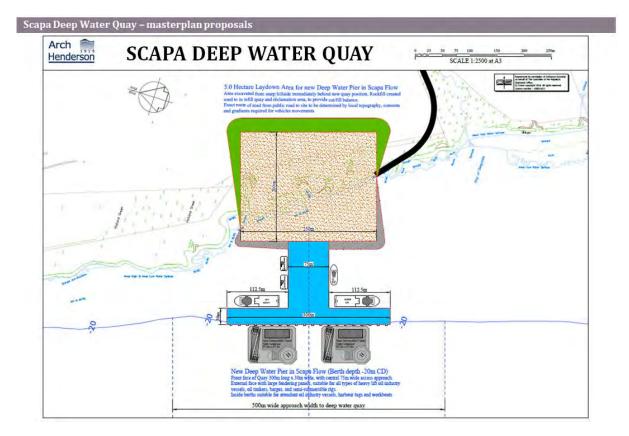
Masterplan Scapa Deep Water Pier Layout. Source: OIC Harbours Masterplan Ph. 1 2020.
